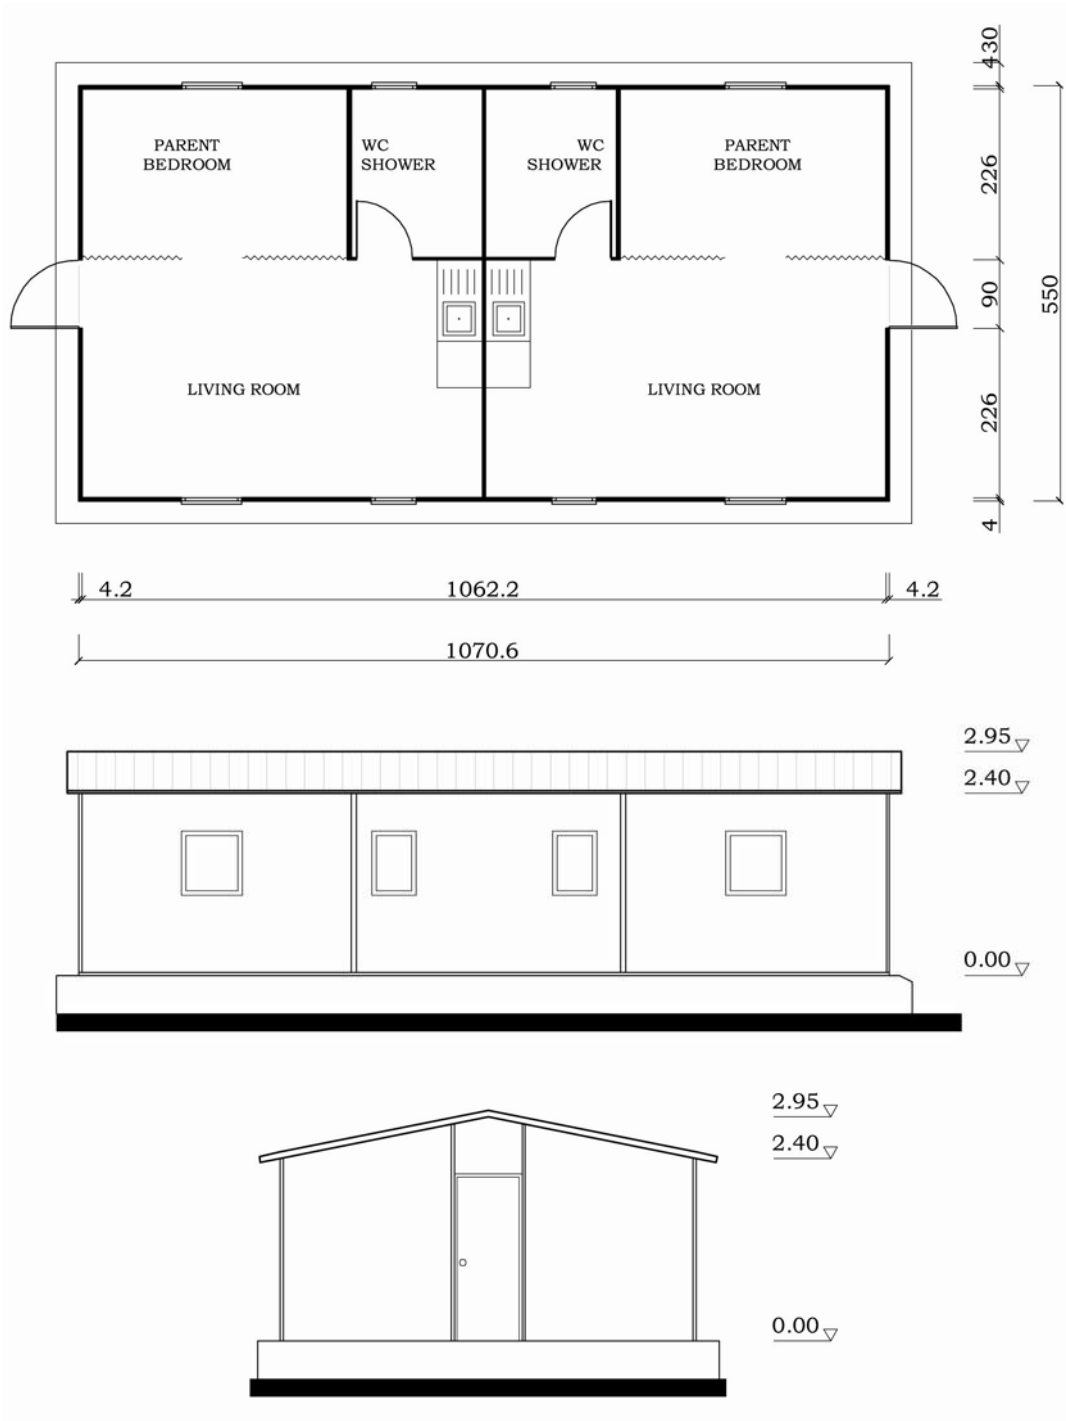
Plan and façade drawings in 1/100 scale provided by the state technical specifications for prefabricated houses.
